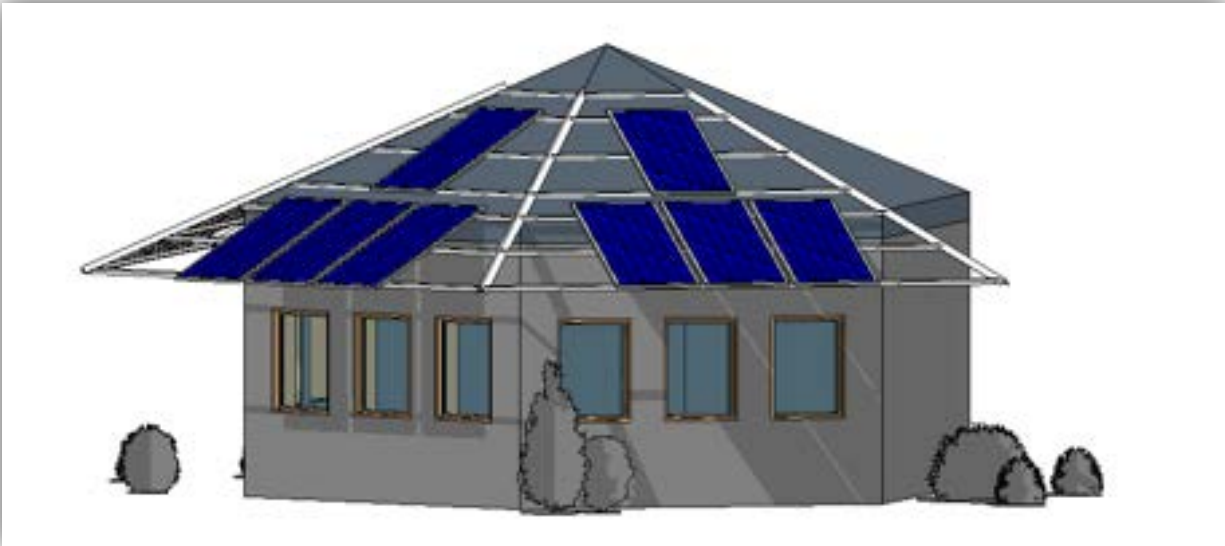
view at 3:00 PM (15:00) during an Summer Solstice (June 21) with 4-foot tall windows raised 2.5 feet above slab and no roof overhang. Illustration of the structural skeleton of the solar awning without additional cladding finish (i.e.: the elements seen above.) Source: primary.
